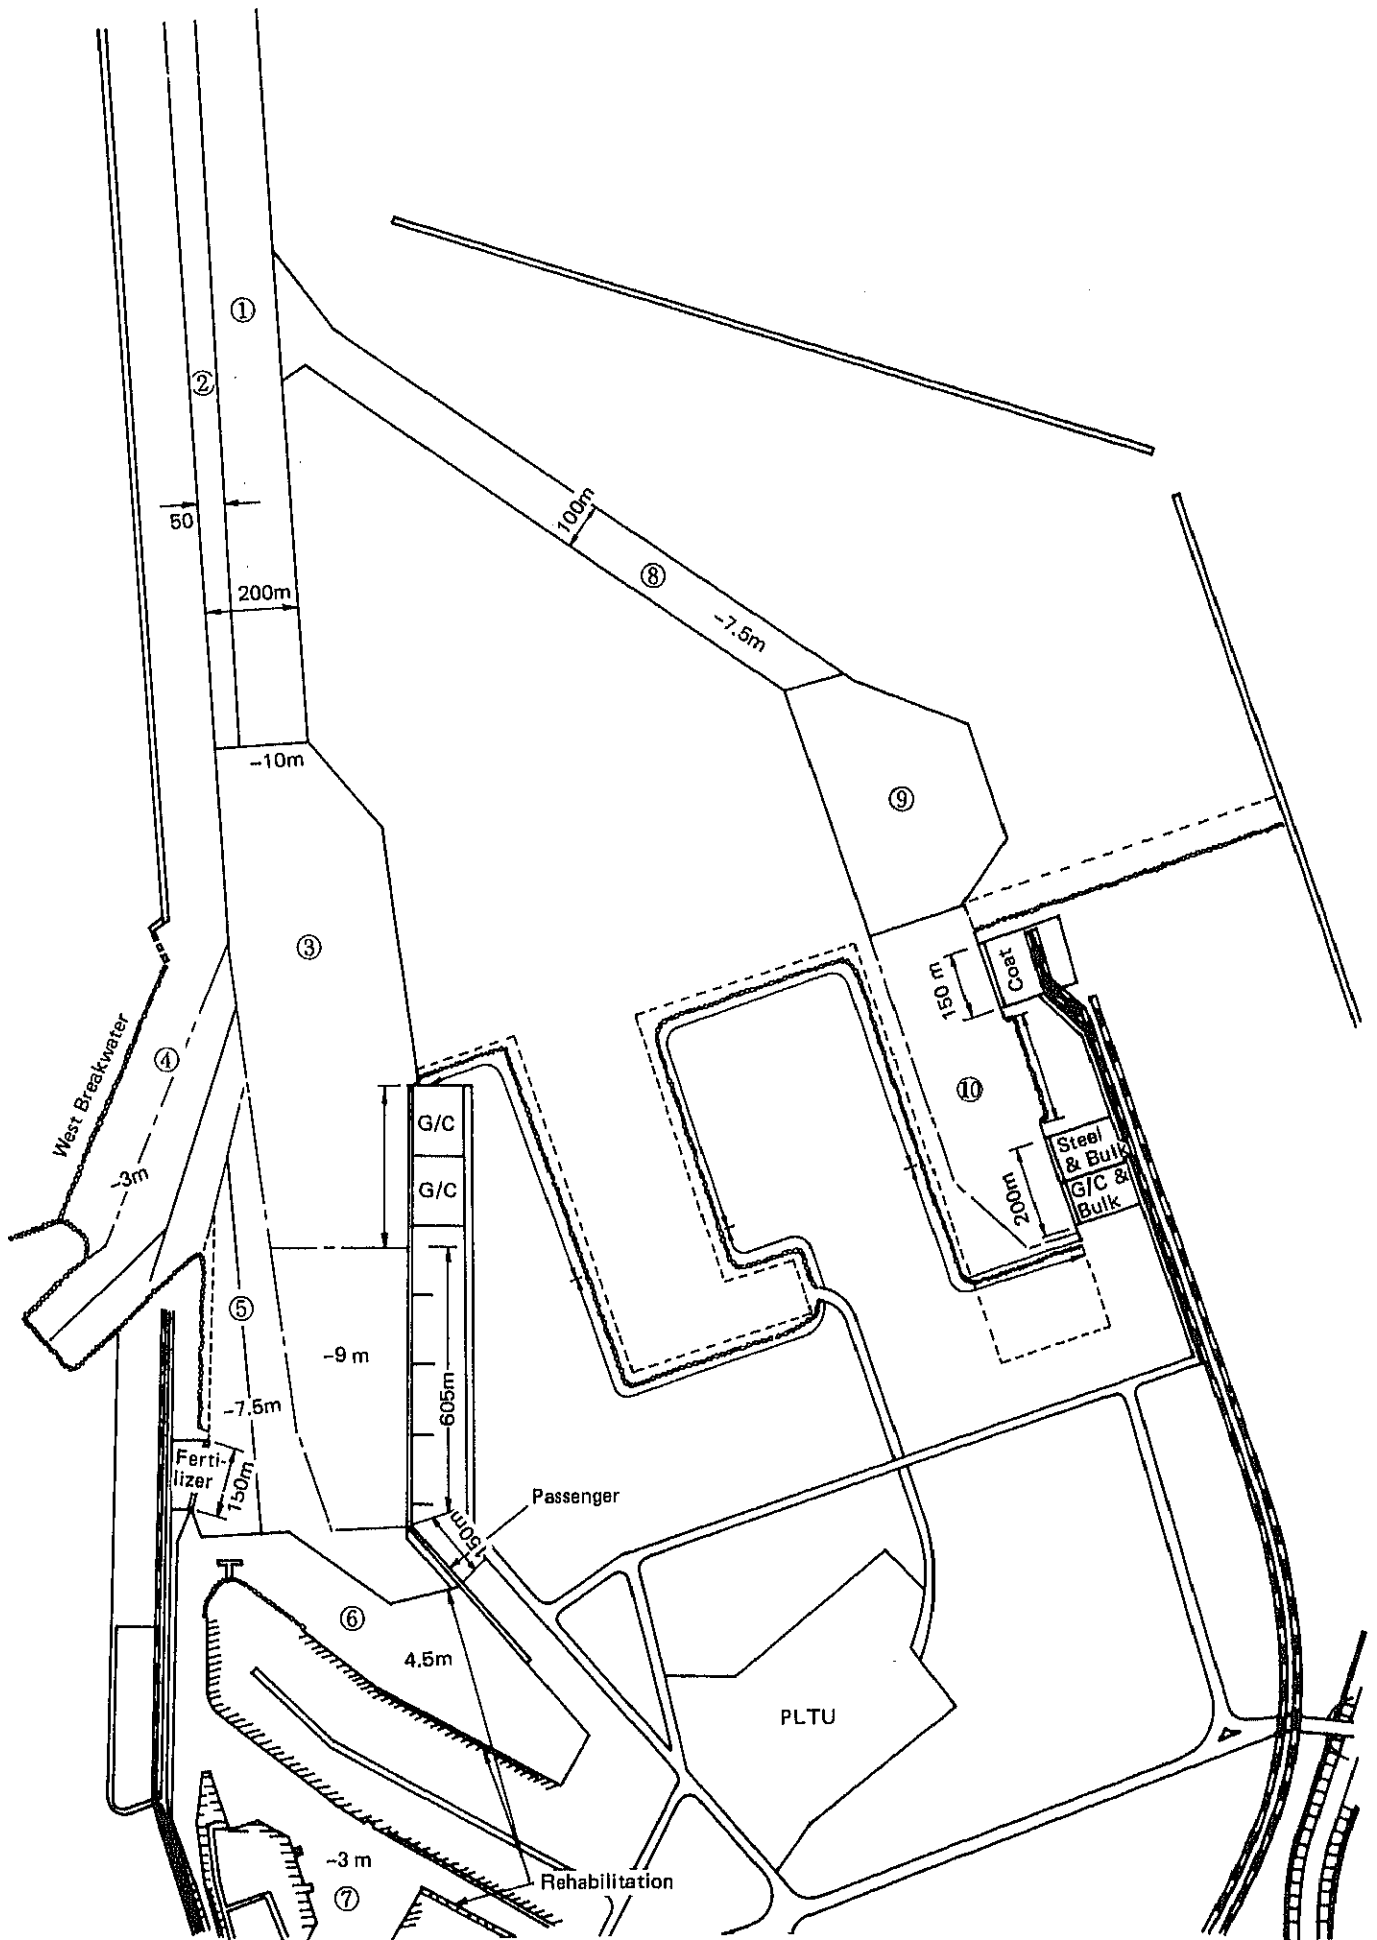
Dredging Plan (Urgent Plan)
